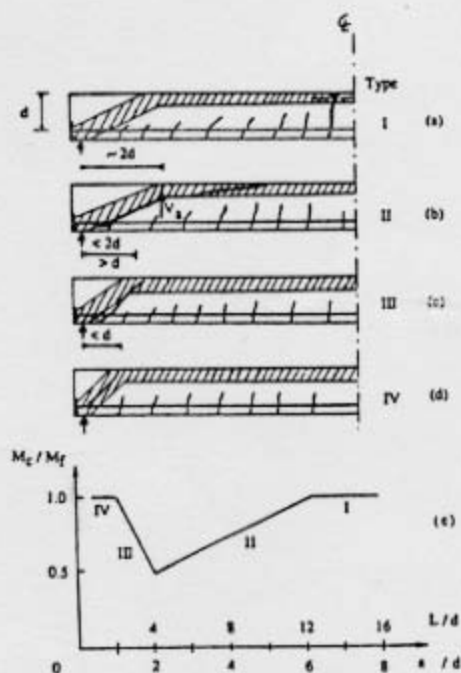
Behaviour exhibited by RC beams without shear reinforcement
